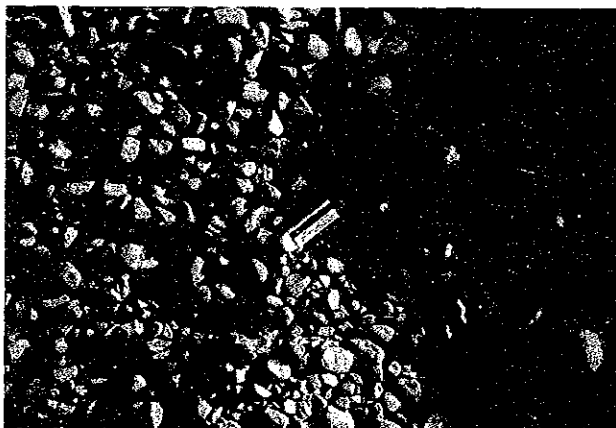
Aggregate for concrete (white object on the center is rubber eraser)
